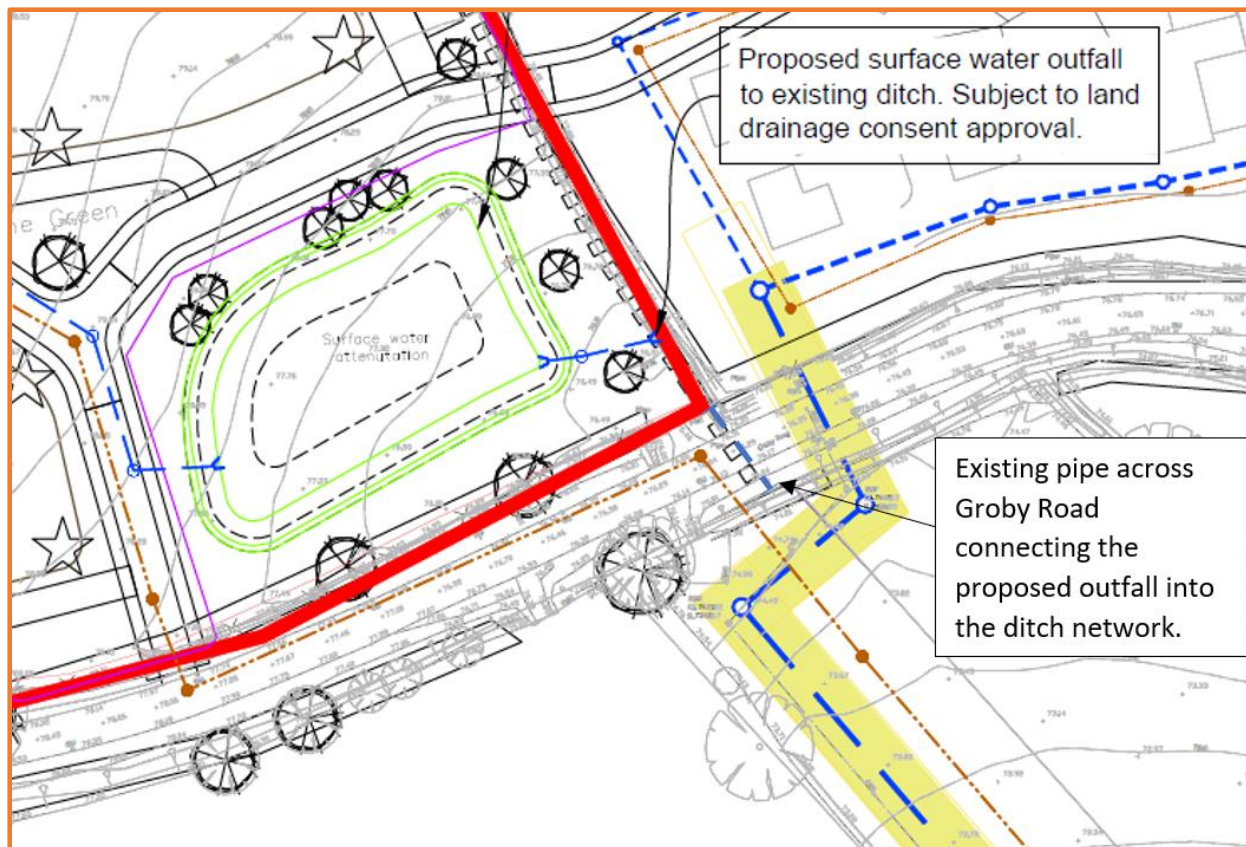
An extract from the proposed drainage strategy demonstrating the connection of the proposed outfall ditch to the wider catchment.
